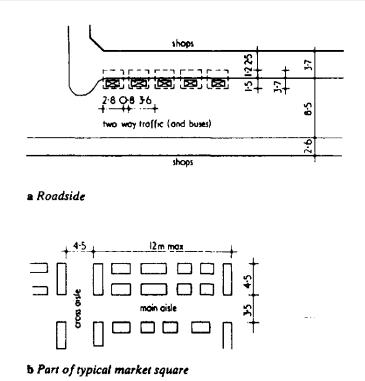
Typical Road Widths and Street Market Stall Dimensions Source: (Alder, 1991)
